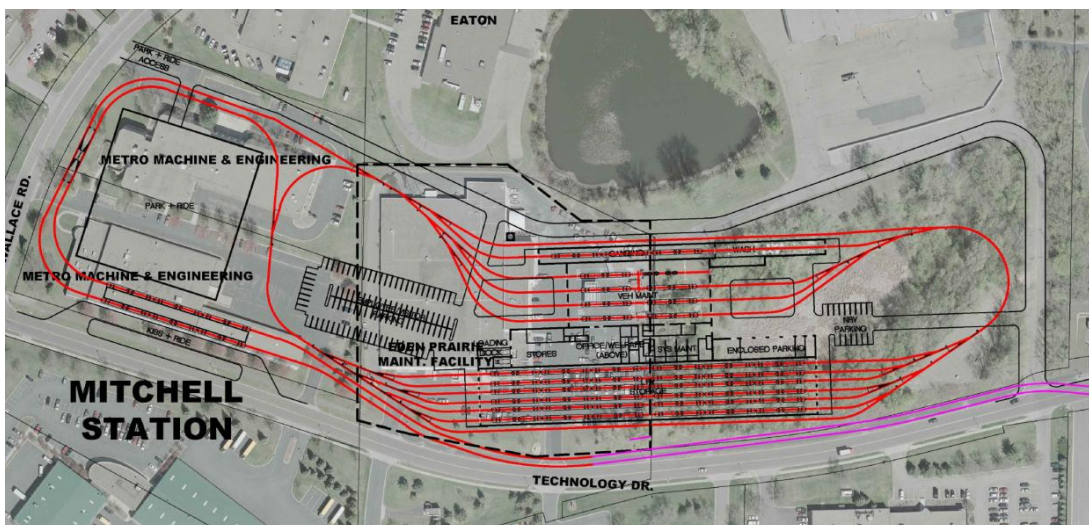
Tier 3 Site 3/4 – City Garage (Eden Prairie)
